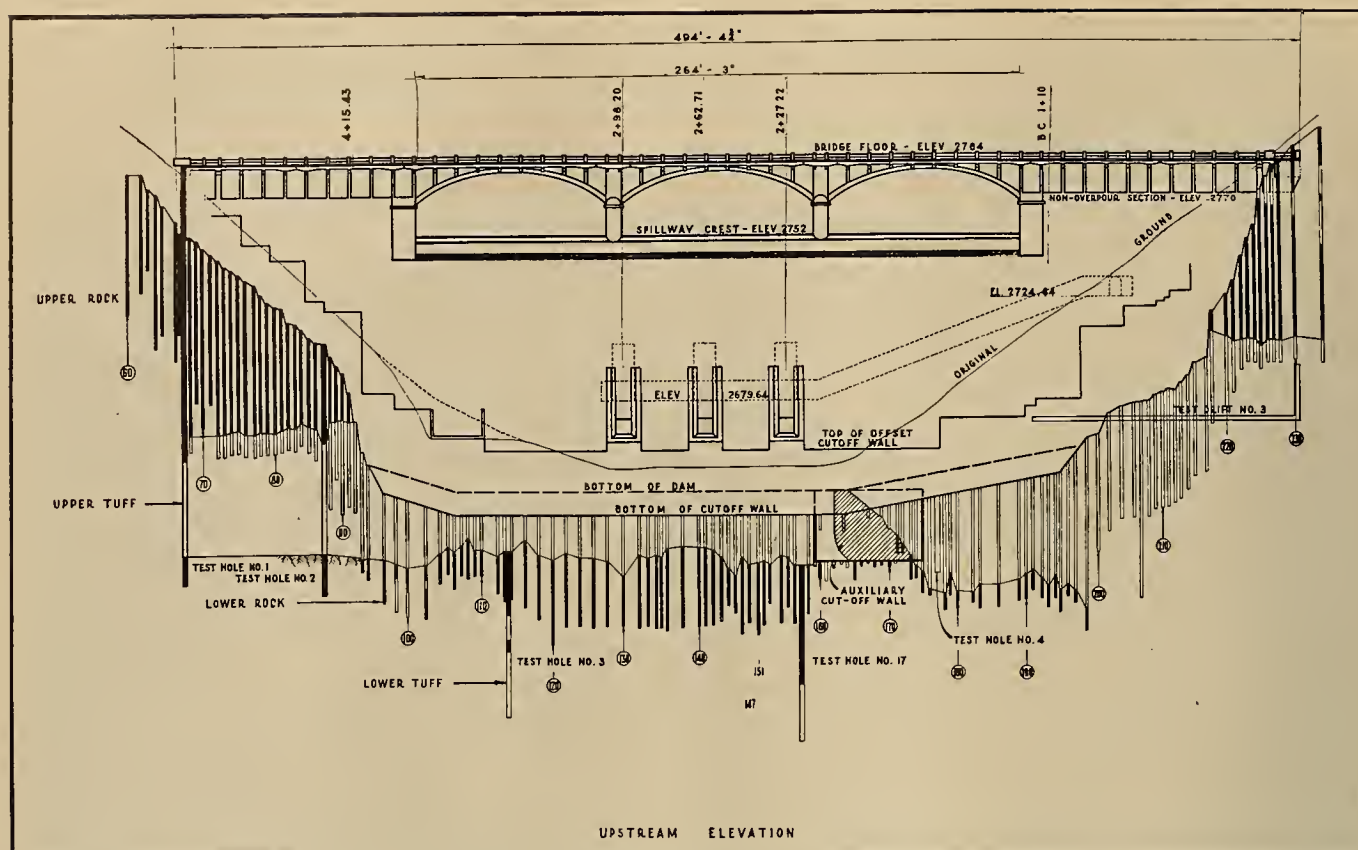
Cross-section of the dam site showing something of the geologic structure underlying the dam and showing grouting holes.
